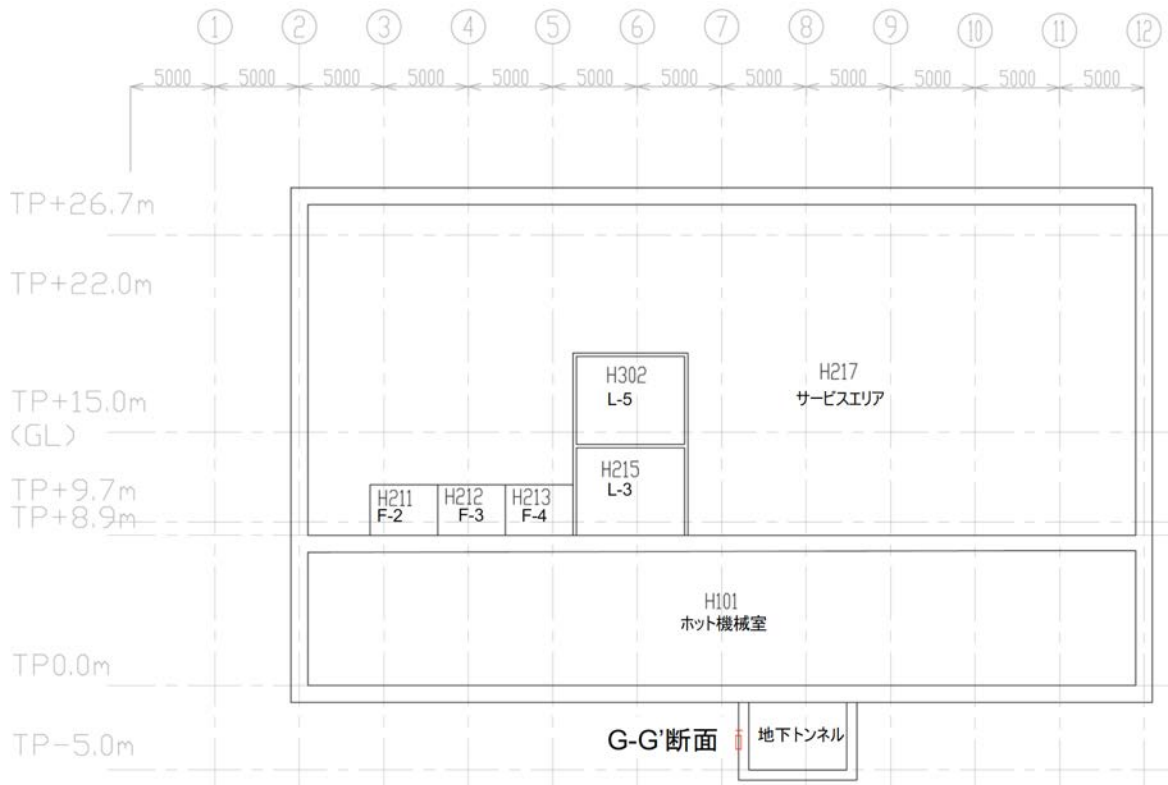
Elevation view of PIE facility (G-G').
